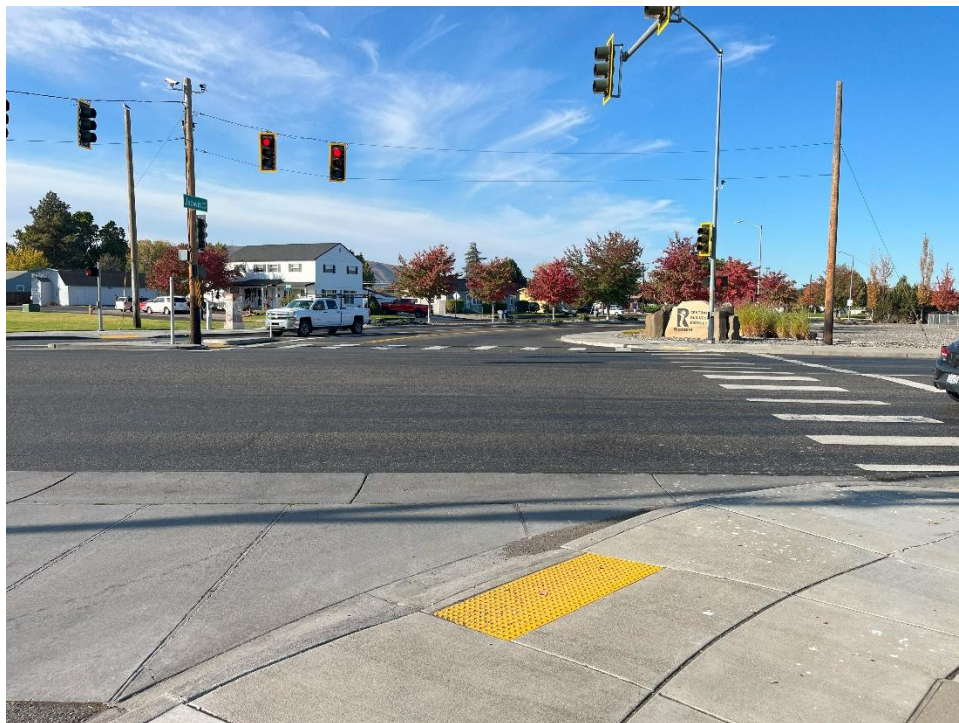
Overview from Photo Point 9 at the intersection of Jadwin Avenue and George Washington Way (Aspect: West)
